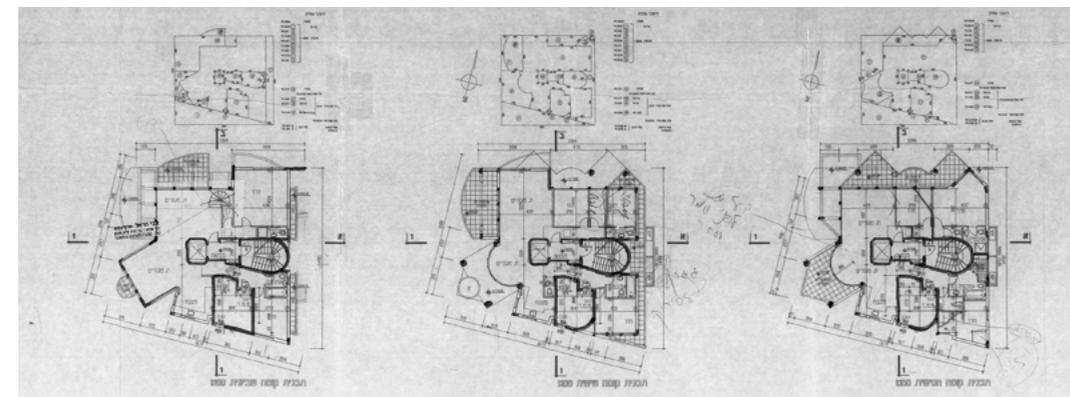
Architect Tzvi Harel, *2 Trumpeldor St. Floor plans of 3 top floors from authorized documents, Tel Aviv, 1994*.
